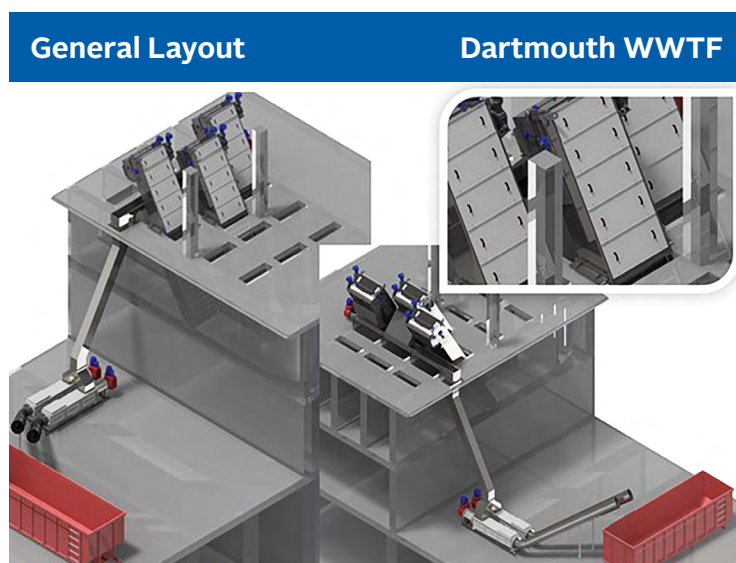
General layout arrangement of DWWTF (IMAGE COURTESY OF VEOLIA WATER).
